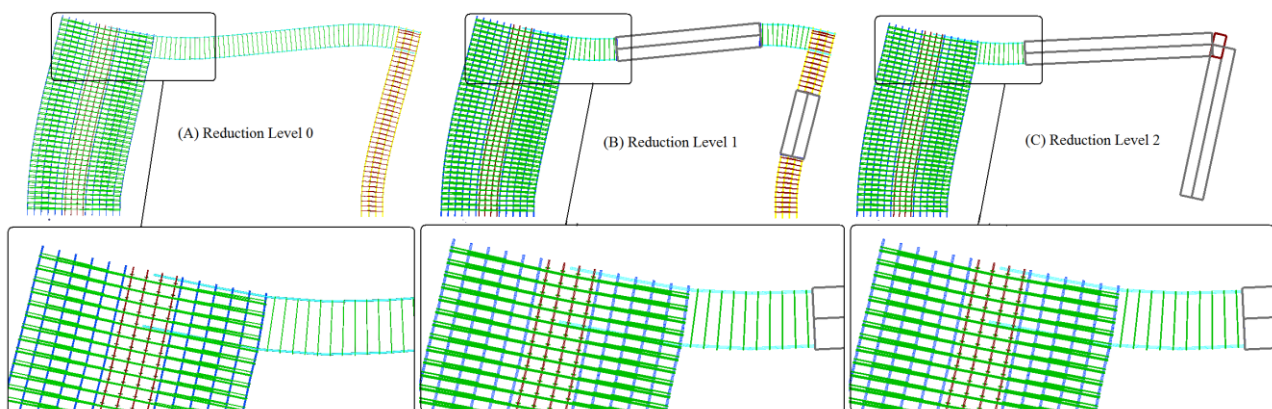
RC FRAME. DEFORMED SHAPES OF REINFORCED REBAR ELEMENTS FOR DIFFERENT FE MODELS (STEP 23). DEFORMATIONS ARE SCALED X50.
